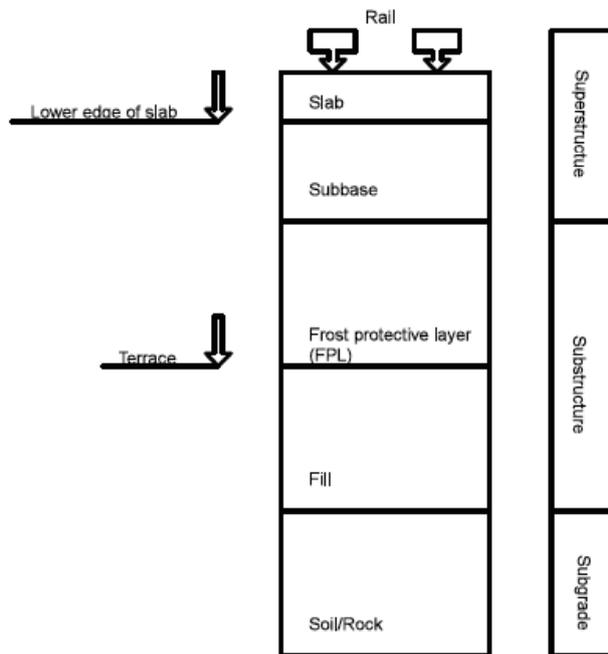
Principal definition of ballastless embankment, with superstructure and substructure.
